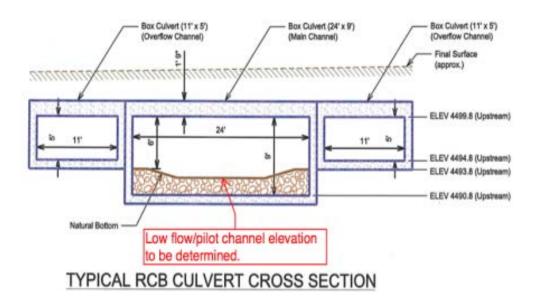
Cross-Section Drawing of Overflow Culverts (From Hobble Creek and I-15 Plan Set).
